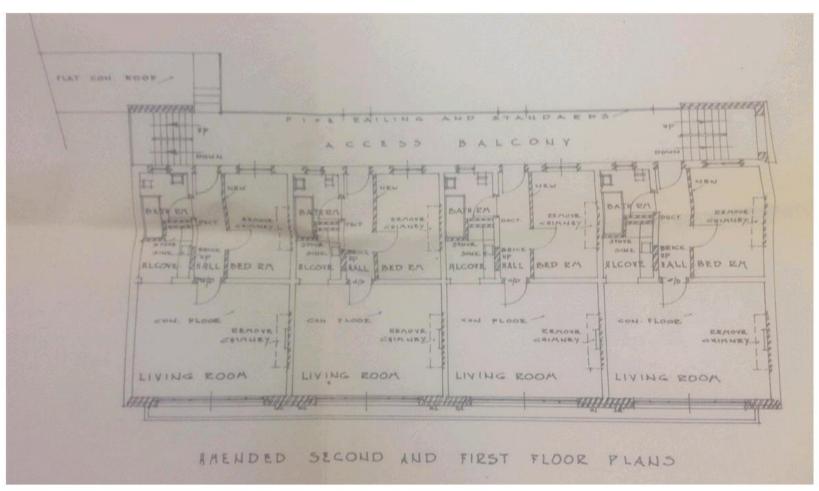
Proposed first and second floor plans, being the converted ground and first floors of Wilmot Terrace.
